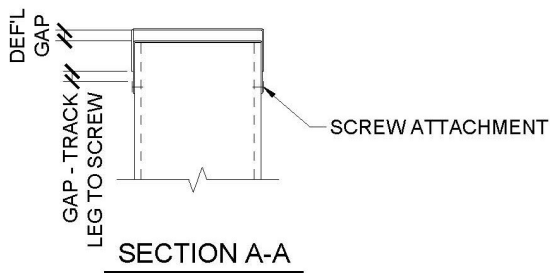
Light-gauge Steel Framing Movement Joint (from Steel Stud Manufacturer's Association, pg. 30)
